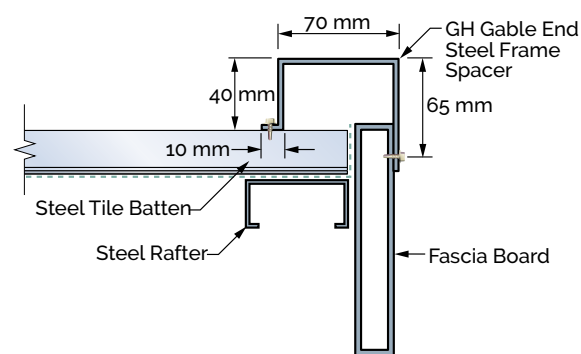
Gable batten installation Angle trim with steel frame gable end spacer
